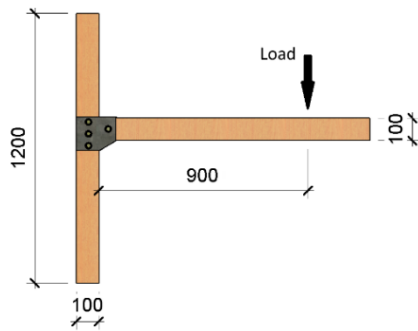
Schematic Illustration of the Beam-To-Column Joint Specimen (Unit Length in Millimeters).
